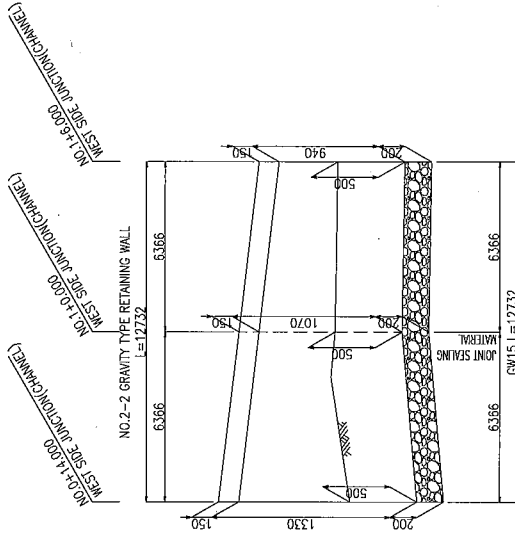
DETAIL OF GRAVITY TYPE RETAINING WALL (TYPE-2)
